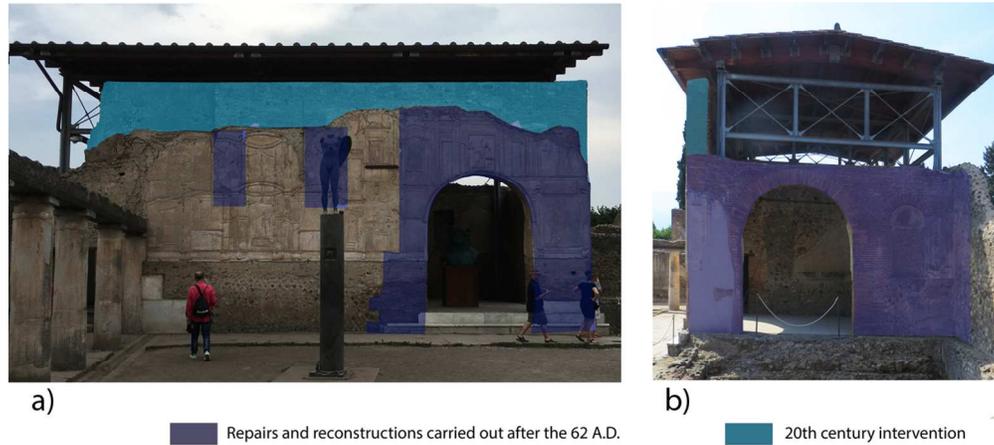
Post-earthquake reconstruction interventions of some masonry wall portions collapsed and infill interventions of the windows on both the east (a) and north (b) wall of the destrictarium-nymphaeum block. The photo shows also the top of the east wall reconstruction, carried out in the mid-twentieth century
